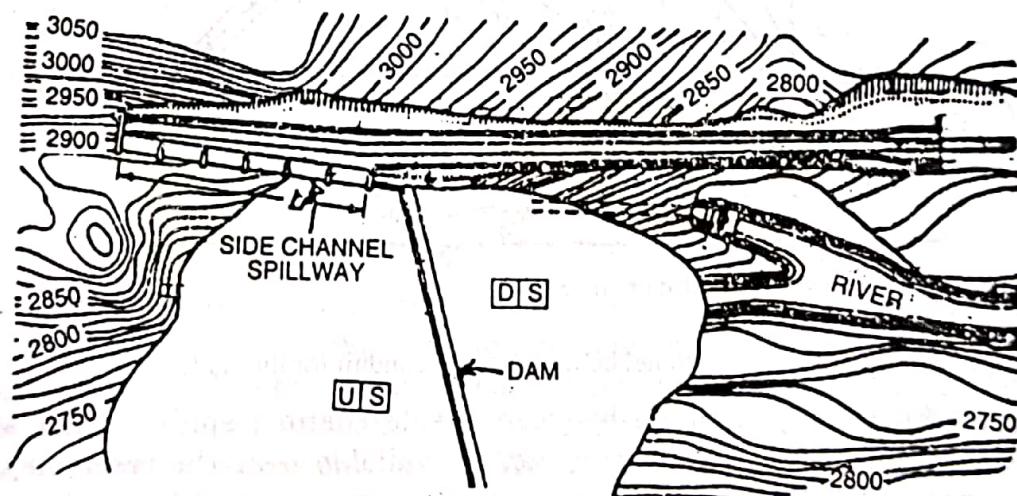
(b) Layout plan of a Side Channel Spillway.
